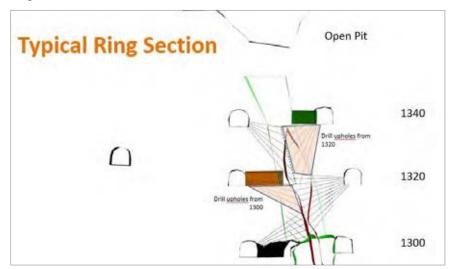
Plan to Drill and Blast Resources above Elevation 1280
